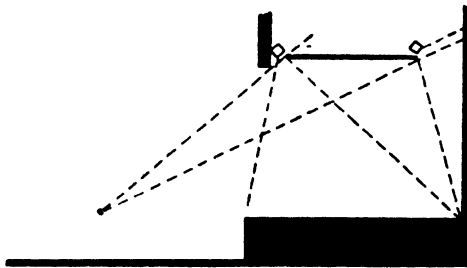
SECTION: CEILING MASKING INSTEAD OF BORDERS
